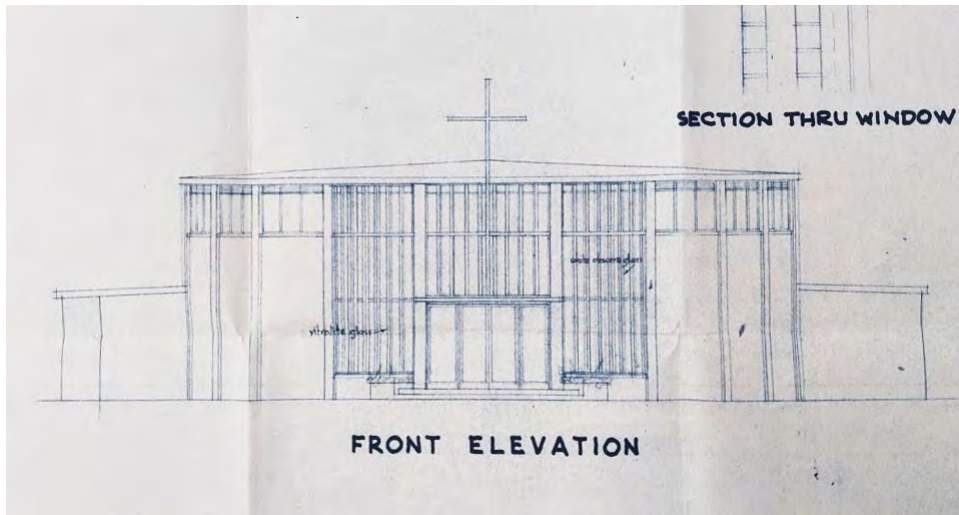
South elevation of the proposed church, by architect Robert O Ellis, dated July 1962 (Source: PROV, PB File)
